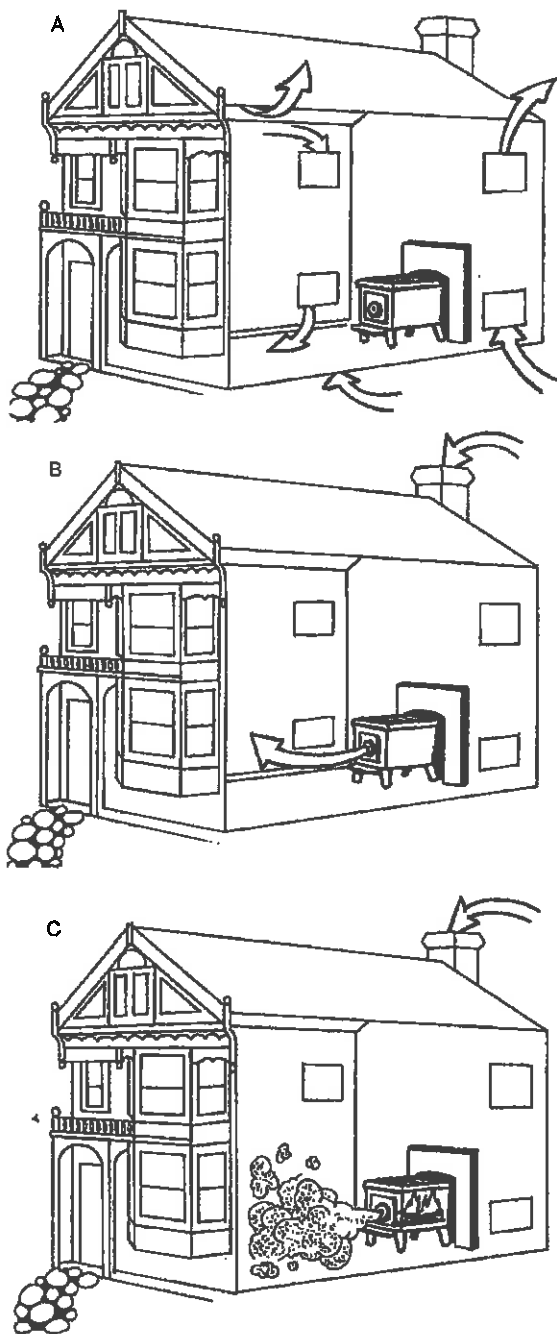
Exterior chimneys in multistory houses often have poor draft. A: The normal air flow into and out of a house on a calm winter day. The air tends to be drawn into the house on the ground floor. B: As a result, many exterior chimneys are non-self-starting; air flows down the chimney when it is cold. C: Even when the chimney is in use, smoke can become sufficiently cool that flow reversal occurs.
